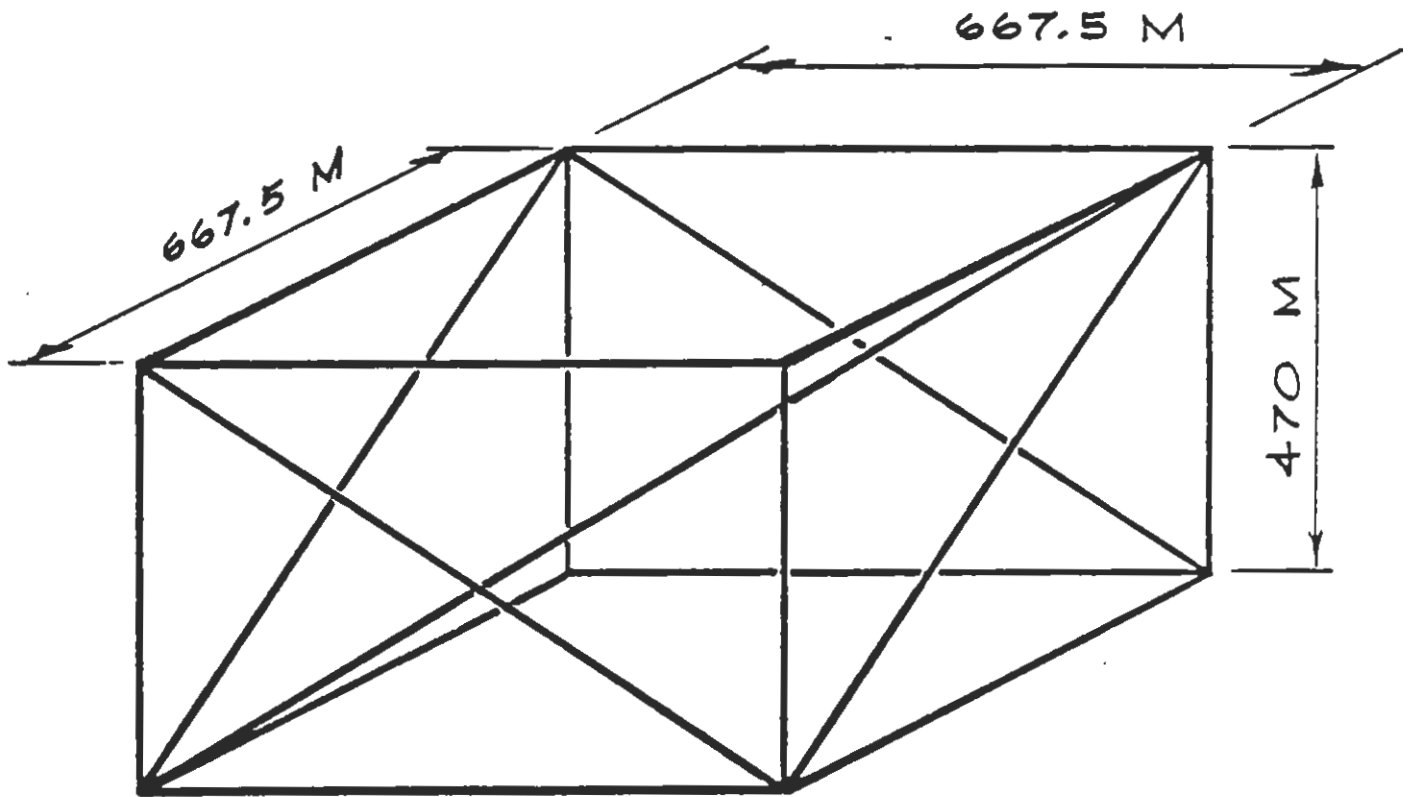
, STRUCTURAL CORNER BAY
